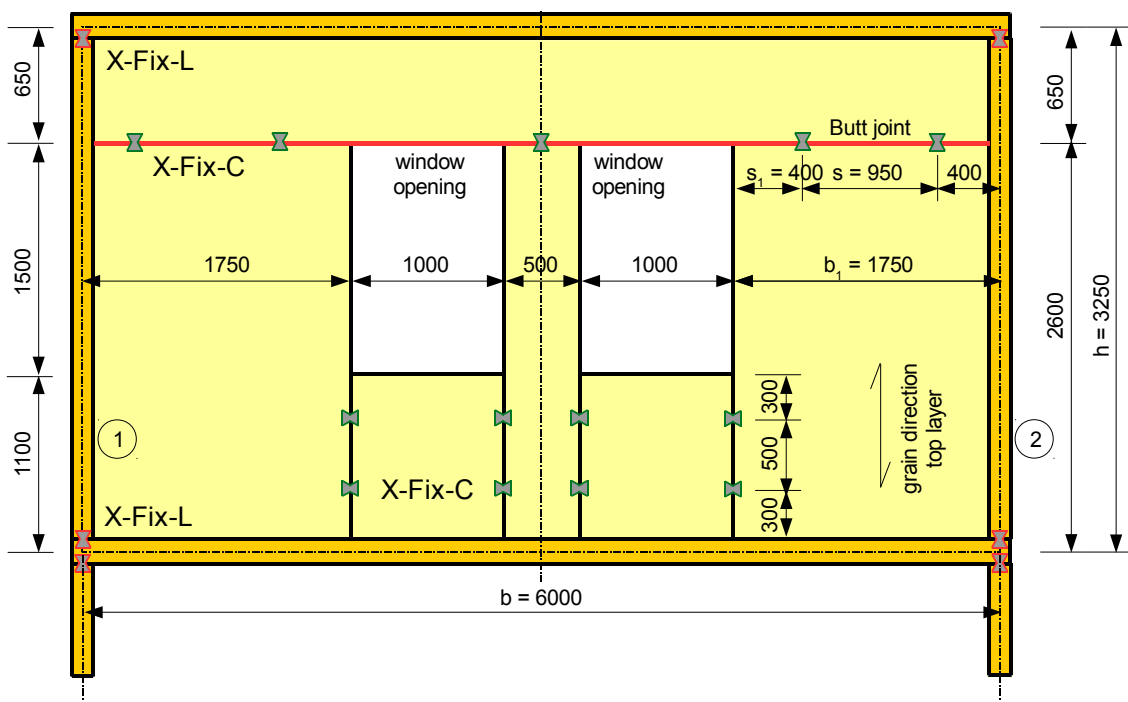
geometry of a CLT wall joined with X-Fix-C connectors (dimensions in mm)
